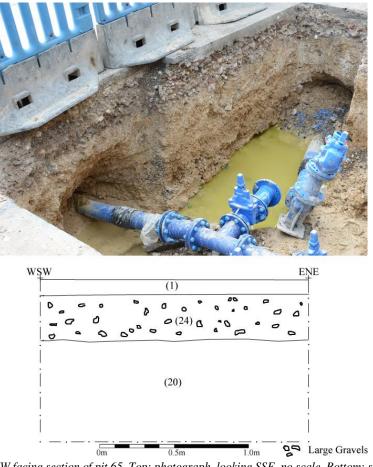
NNW facing section of pit 65. Top: photograph, looking SSE, no scale. Bottom: sample section, original drawn at 1:10
